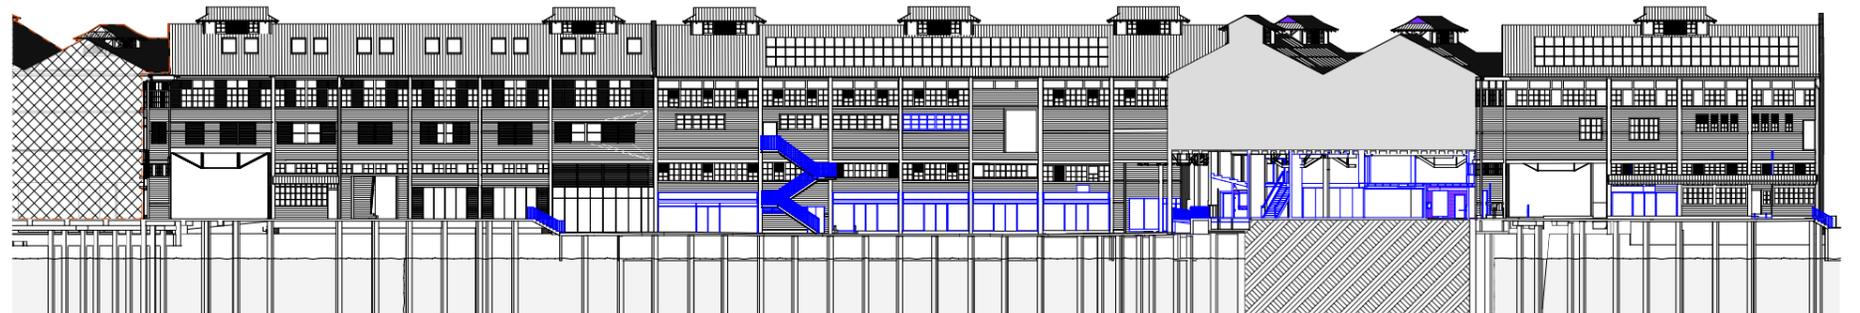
Proposed north elevation Shore Sheds, (alterations shown in blue).
